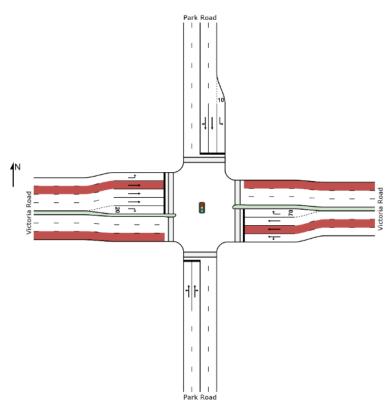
At-grade upgrades required for Victoria Road/Park Road intersection – V2
